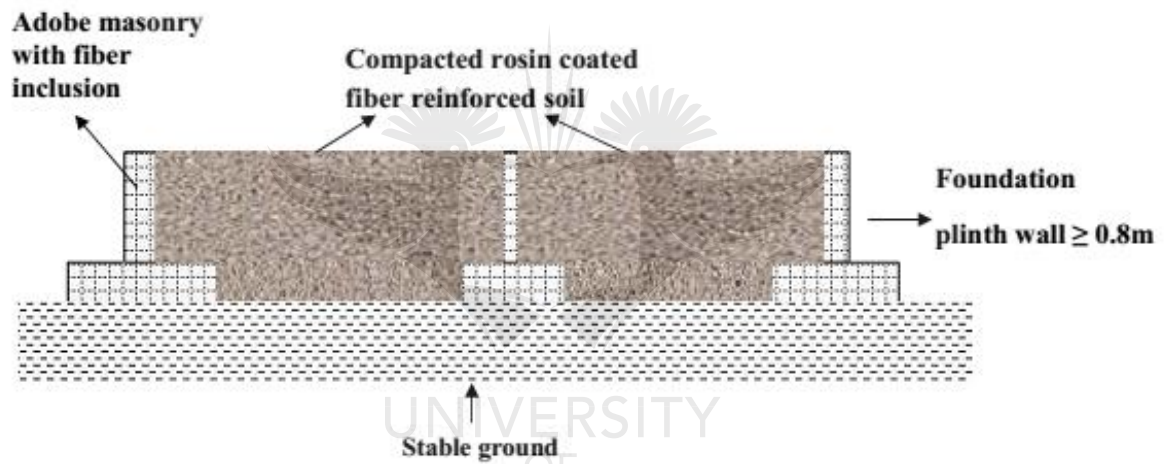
Proposed foundation details for seismic retrofitting of earthen structures
